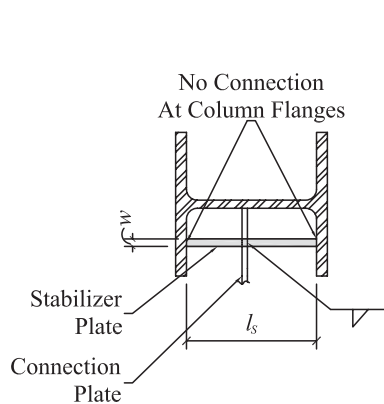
Type I floating stabilizer plate (no connection to column flanges).
